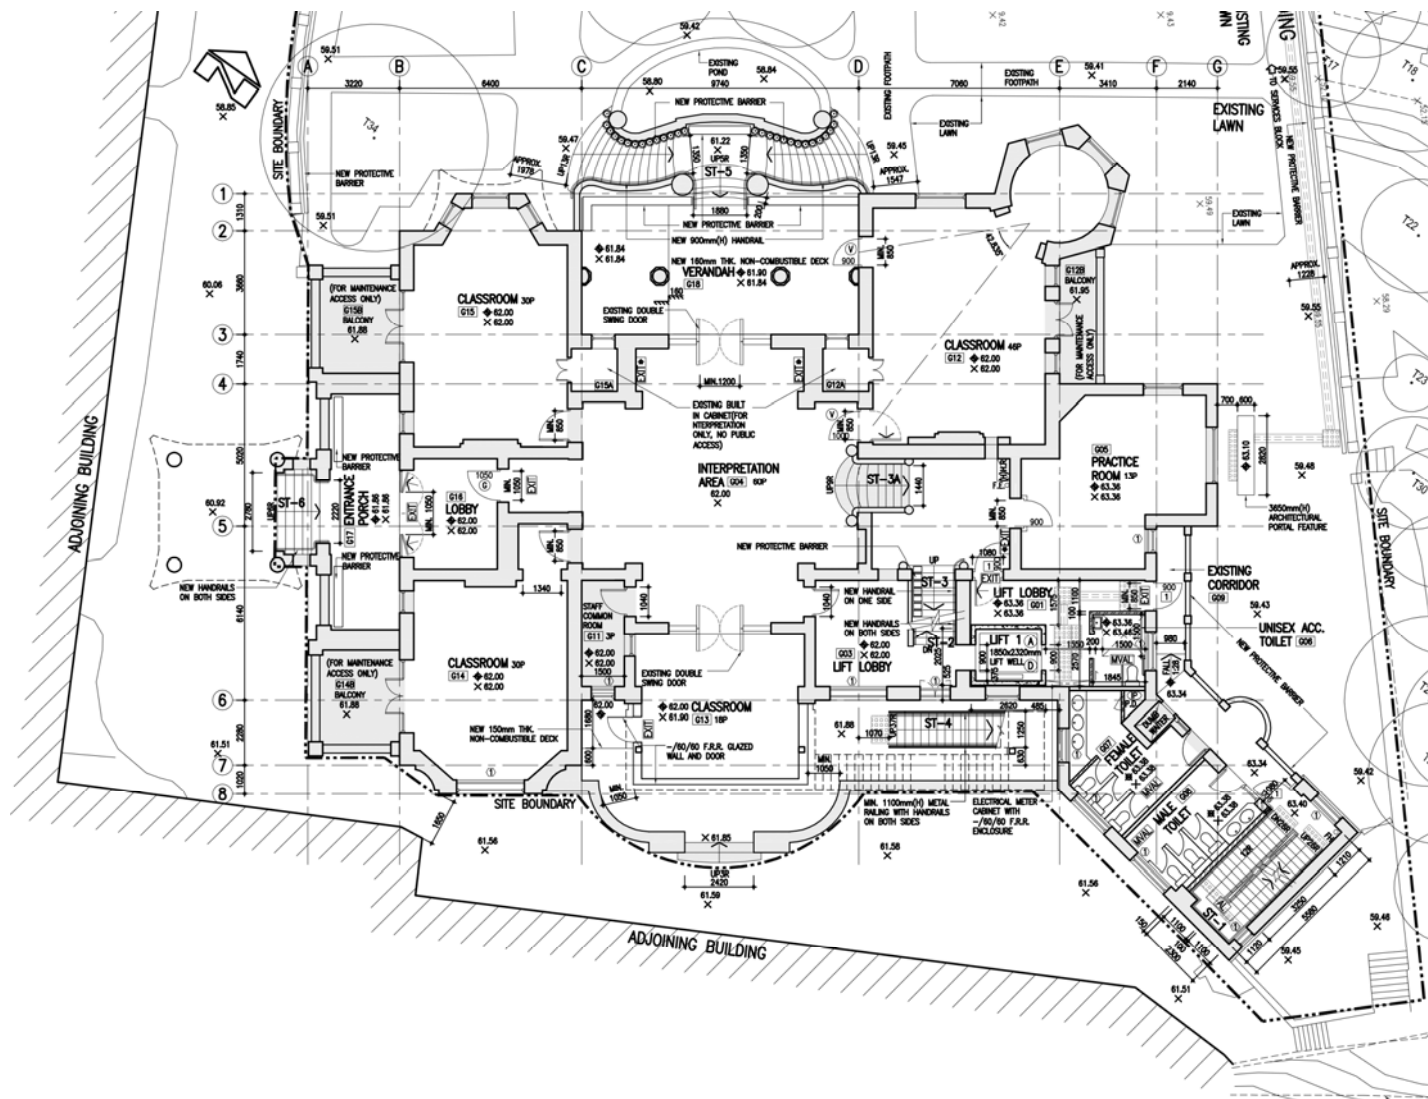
Proposed Ground Floor Plan of the Mansion (not to scale)
